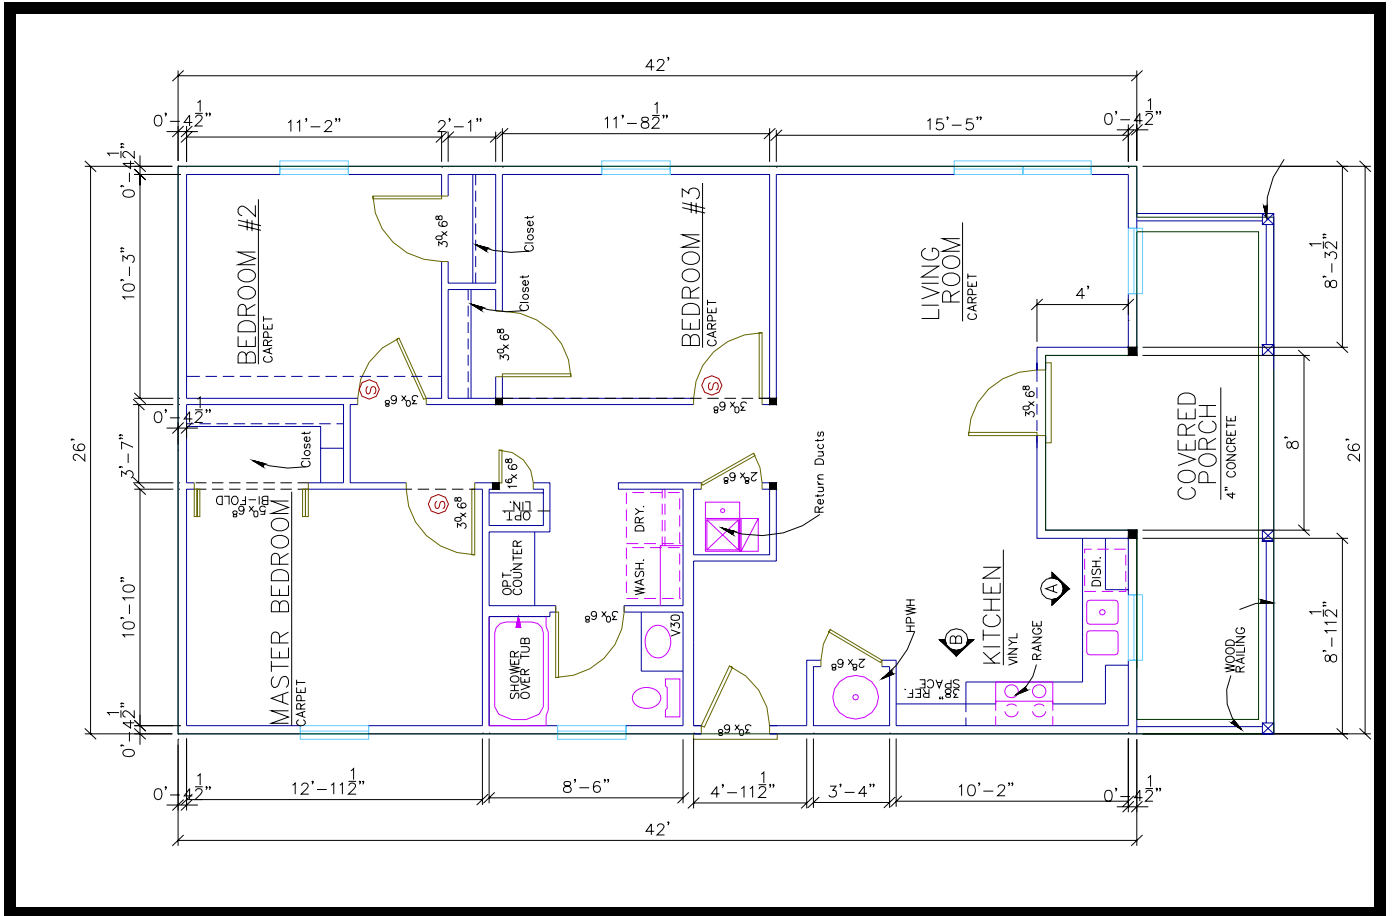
, ZEH2 House Plan, the north façade is at bottom.
